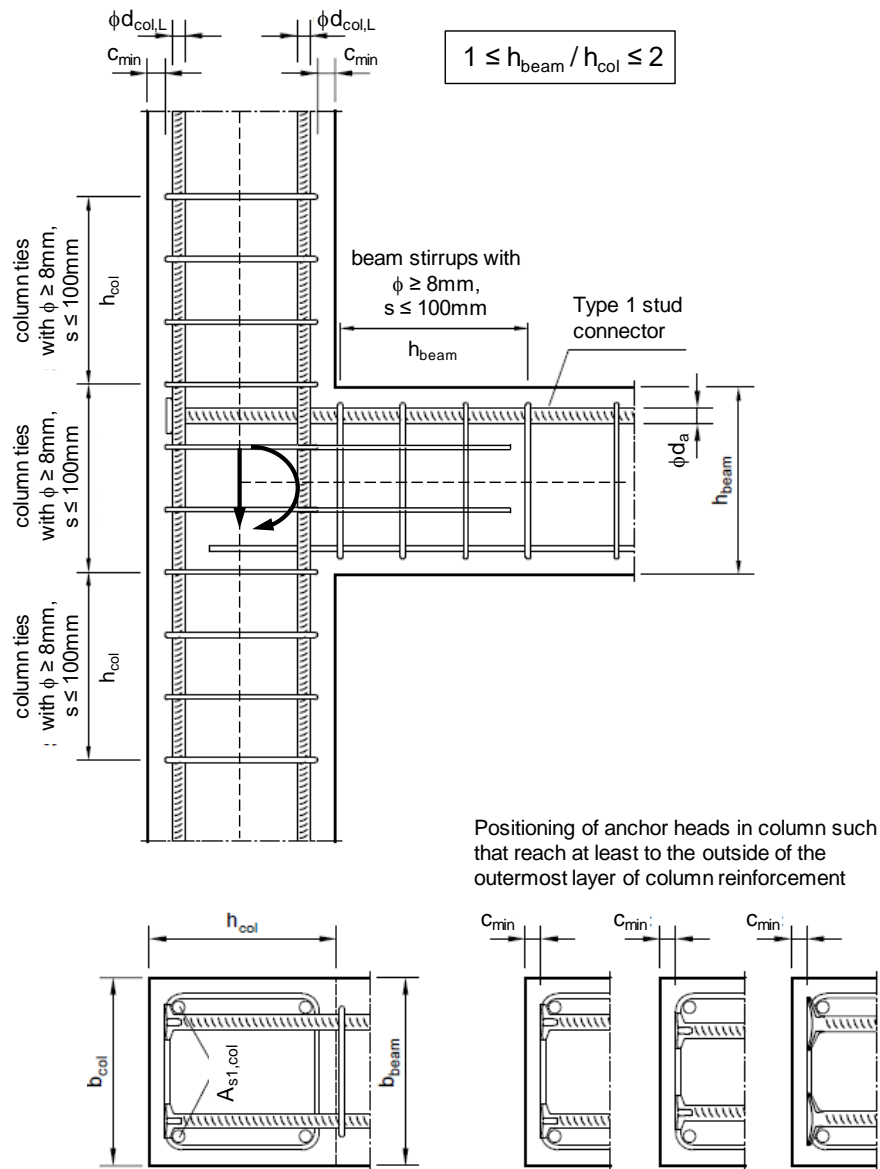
Dimension and reinforcement details for exterior beam-column joints
